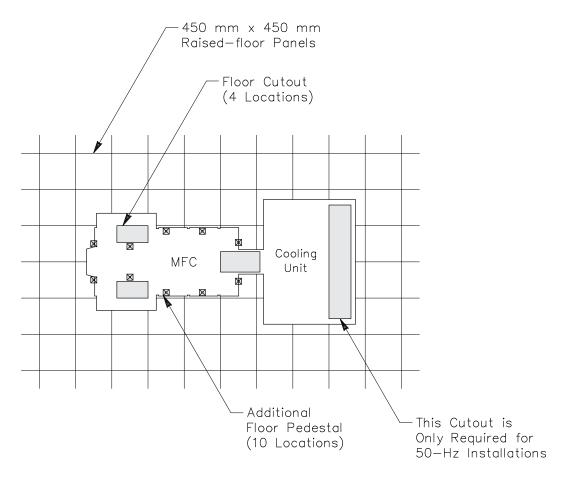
CRAY T3D MCA Floor Plan on 450 mm x 450 mm Floor Panels
